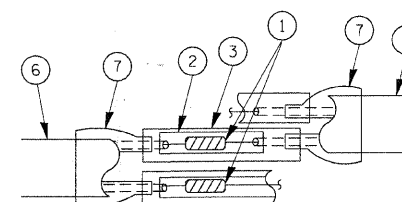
DETAIL "A" LOOP-TO-LOOP SPLICE
